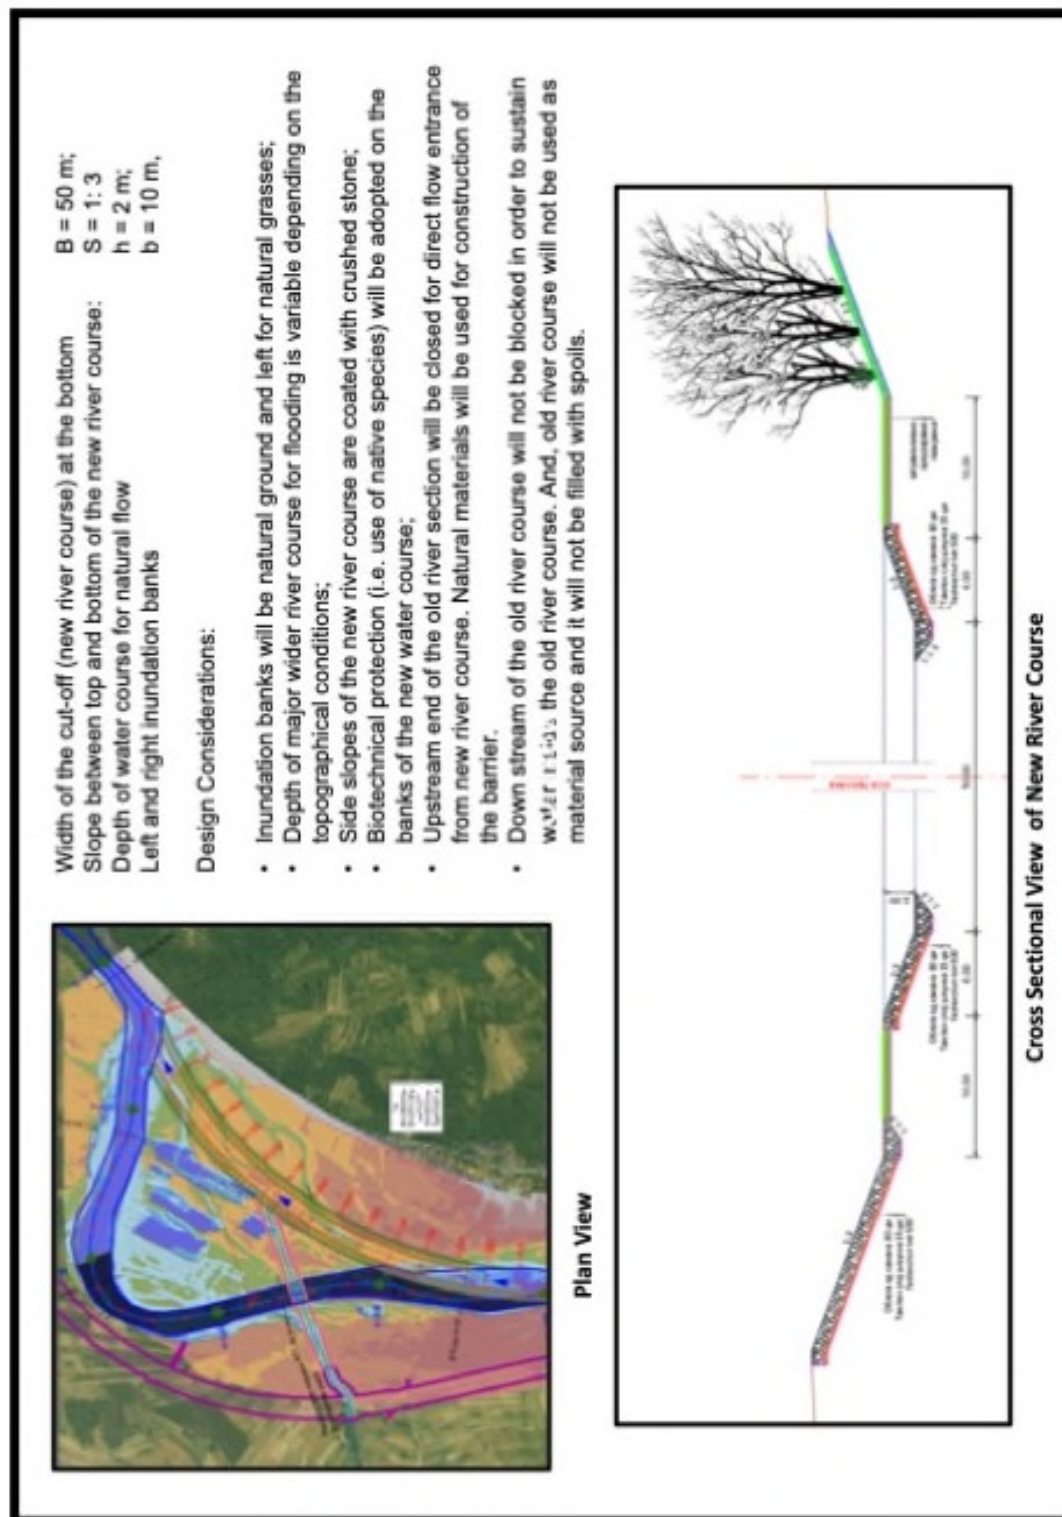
The route and typical cross-section of the Structure 1, Section-1
